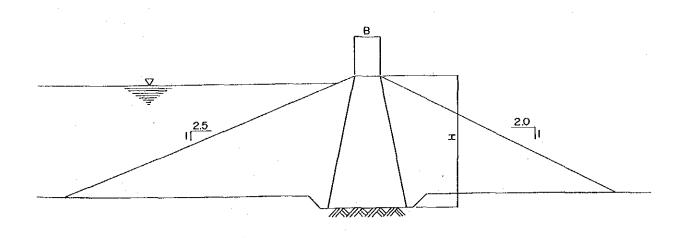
(I) PRELIMINARY LAYOUT OF DAM
